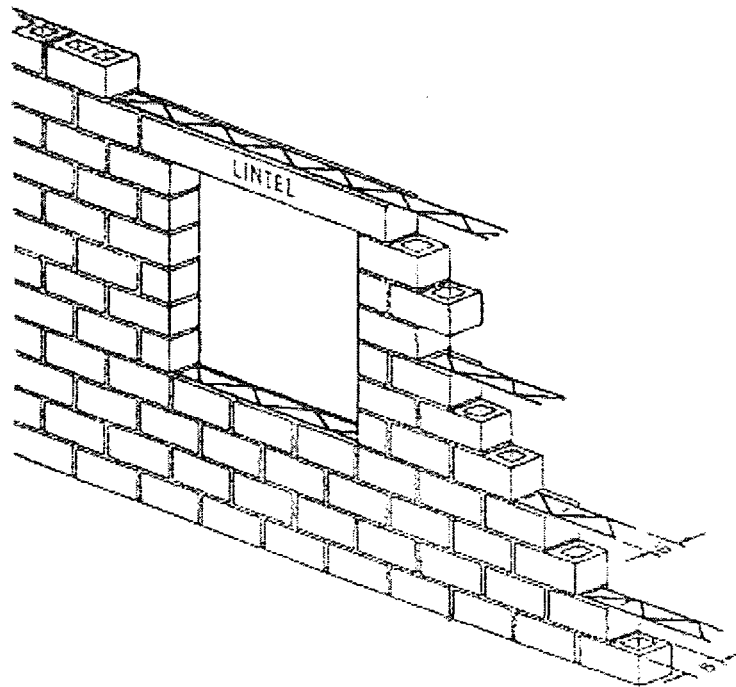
Lintel over an opening in a wall, supported by truss-type longitudinal wire reinforcement (Taly, 2001)
